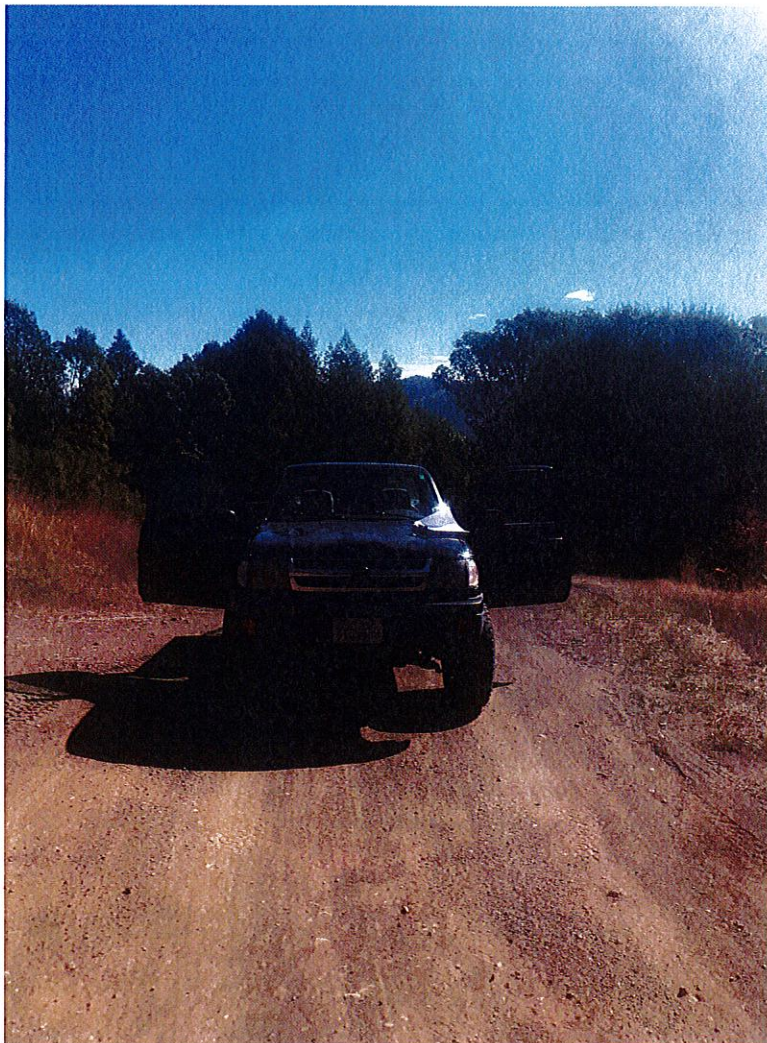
RP-1. Entrance to APN: 216-135-008. Road width: 21' 11".
